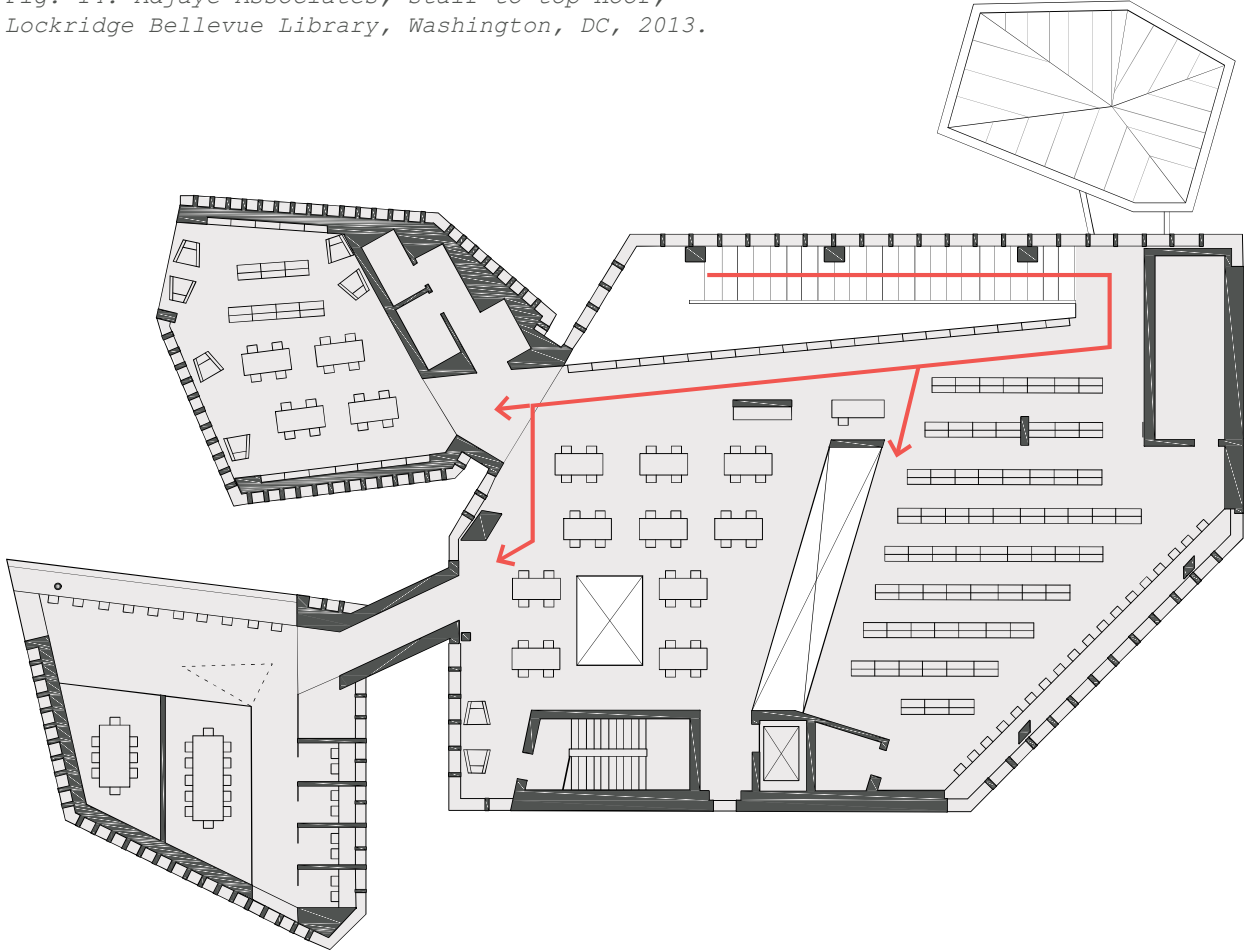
Adjaye Associates, top (third) floor plan, Lockridge Bellevue Library, Washington, DC, 2013.
